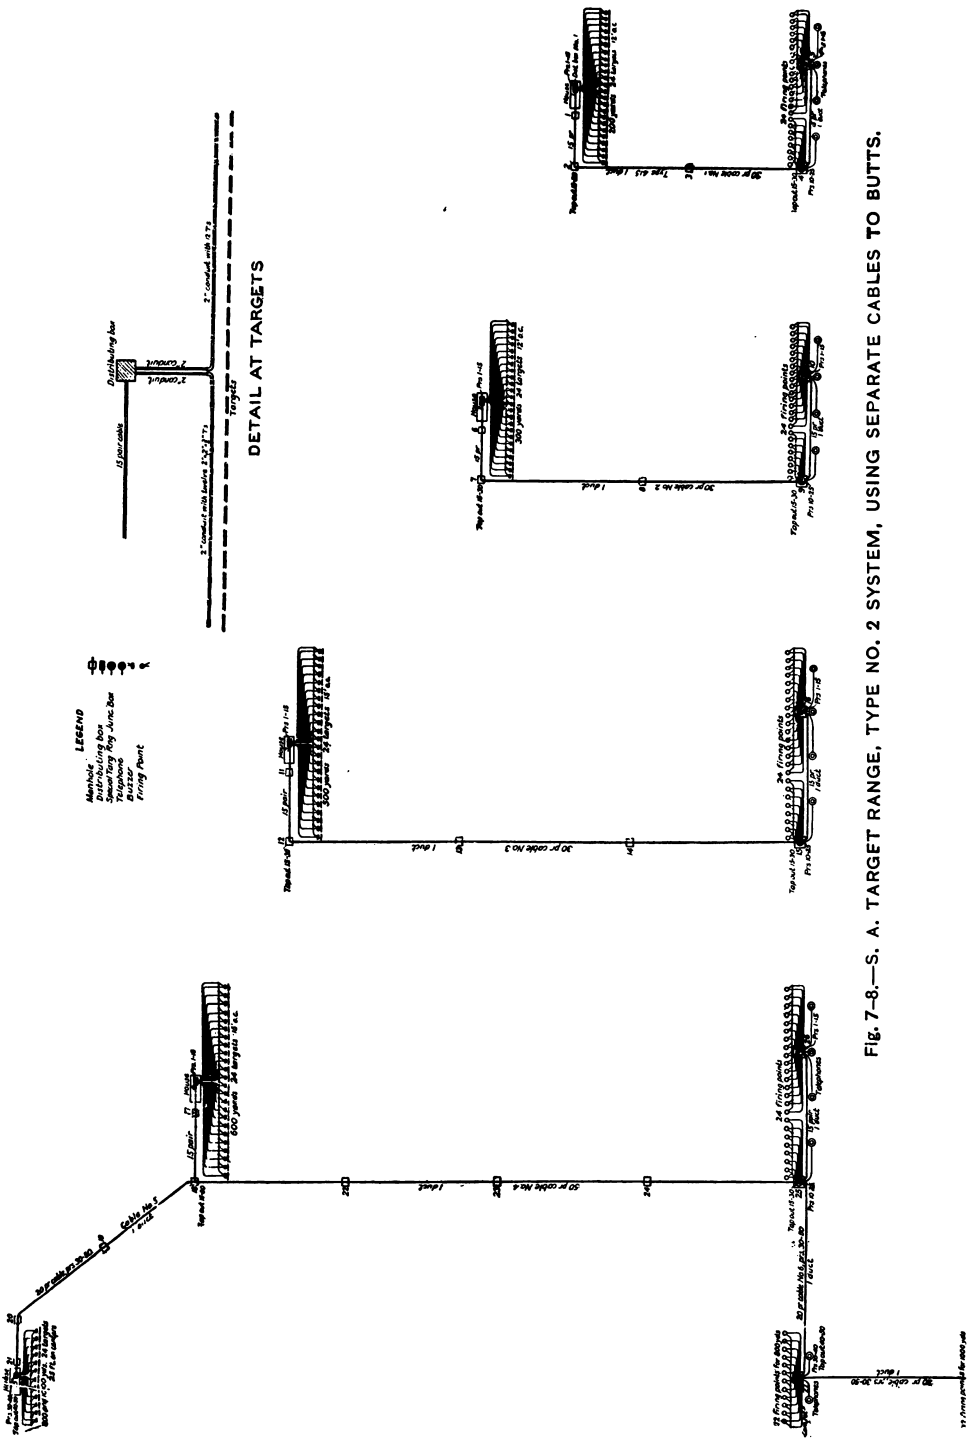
S. A. TARGET RANGE, TYPE NO. 2 SYSTEM, USING SEPARATE CABLES TO BUTTS.
